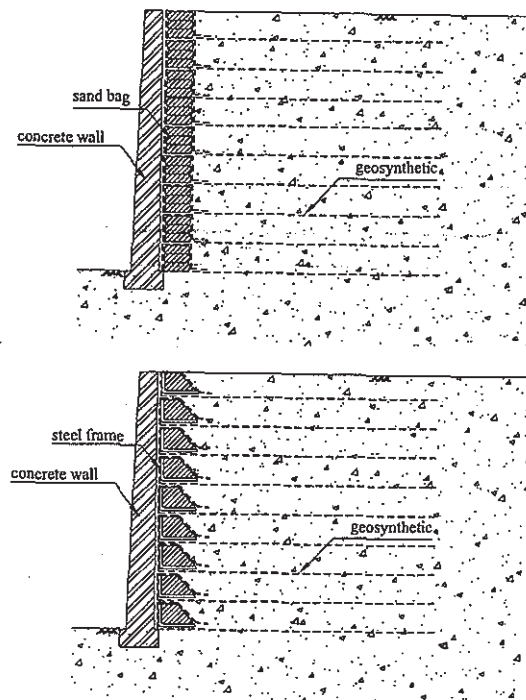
Range of applications where the reinforced Railroad/Road with Rigid Facing Method (RRR)
